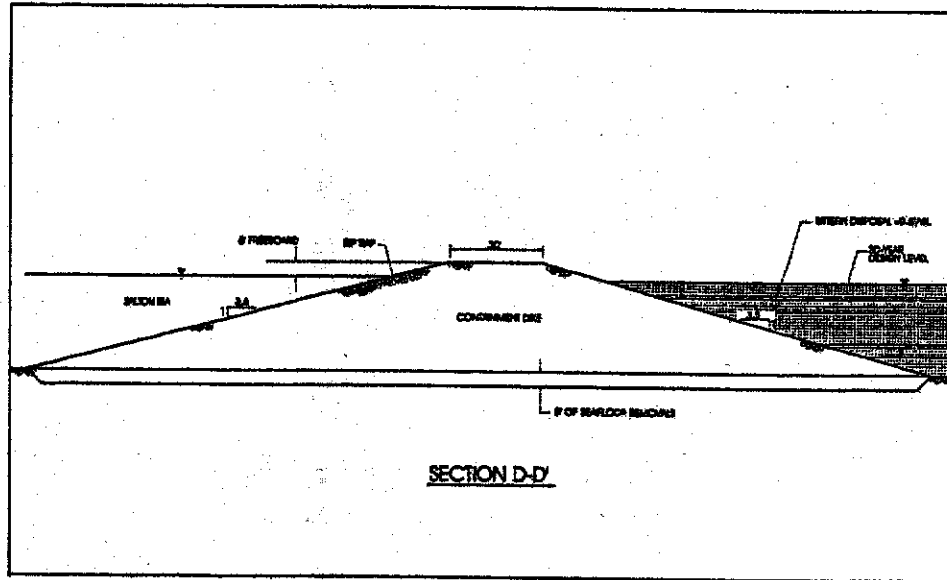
Typical Embankment for In-Sea Containment Dike
